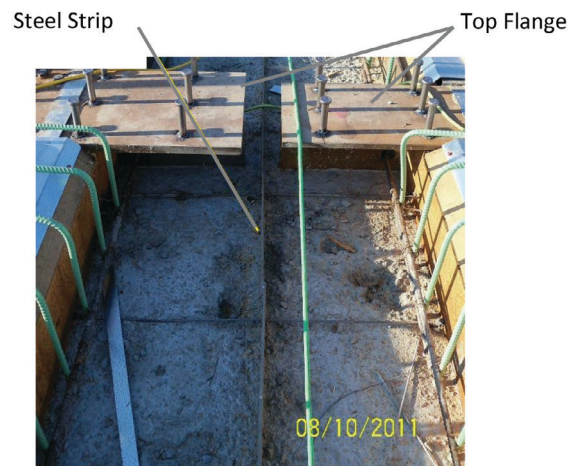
Detail to induce cracking between girder ends, resulting in reduced continuity.
